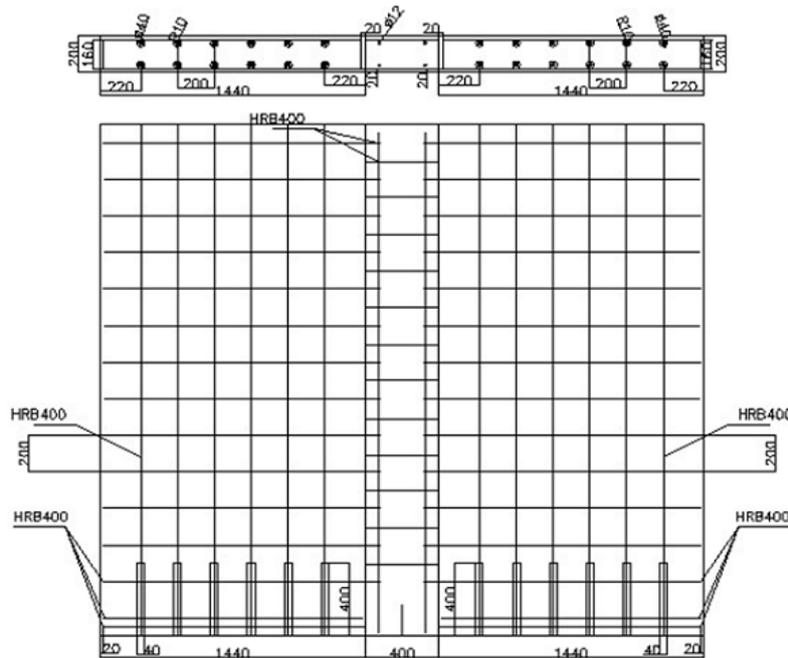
Precast shear wall and cast-in-place node dimension reinforcement graph
